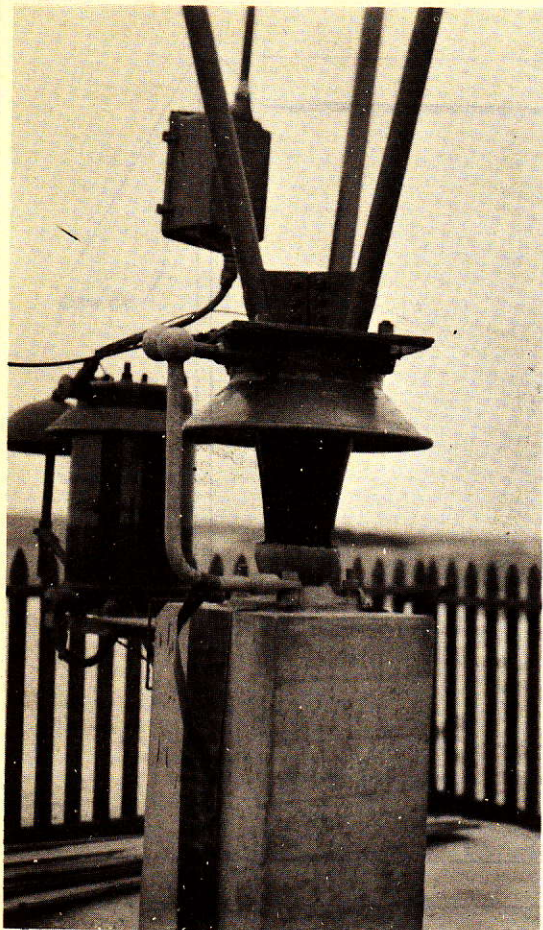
Lighting Transformer A-2743 Installation on 300-Foot Tower.
